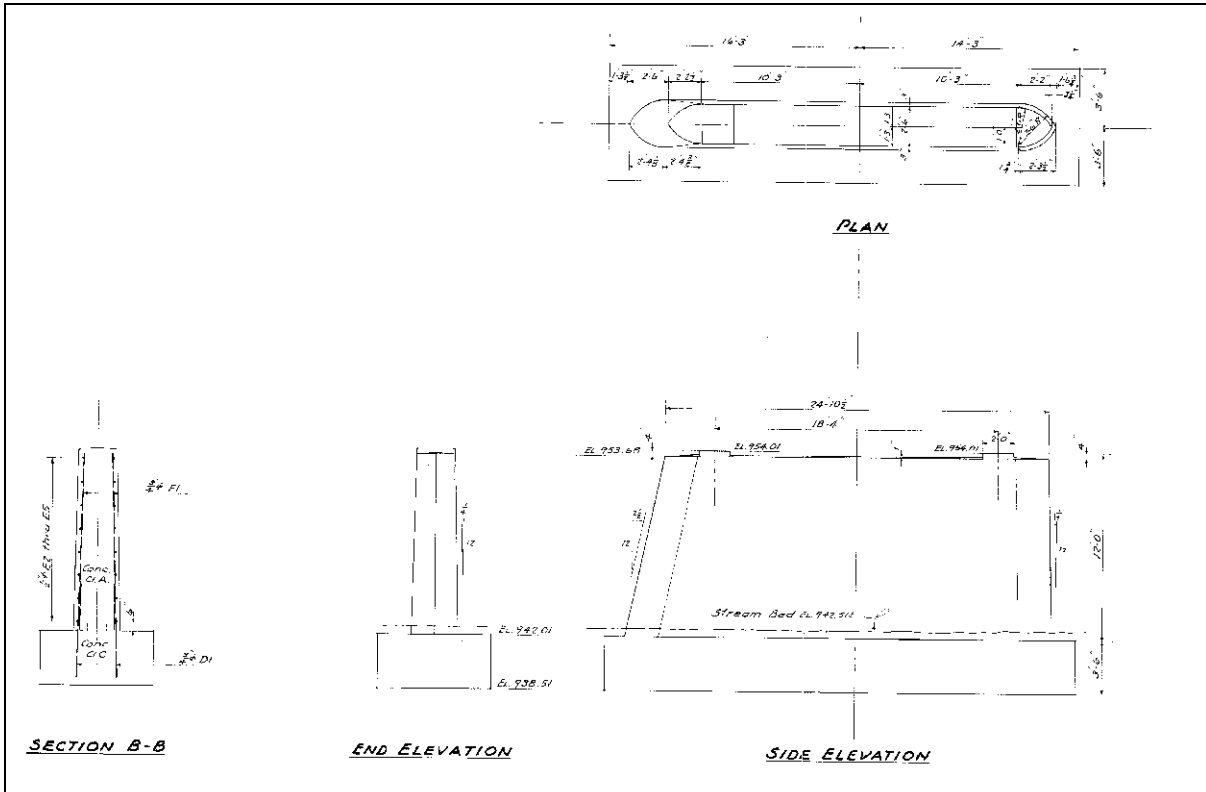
Plan of emergency concrete pier constructed in 1948 (from NHHD Plan No. 2-11-2-13, dated Aug. 1948).
